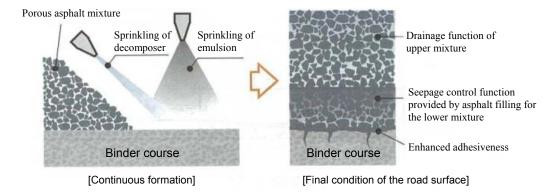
Construction of impermeable drainage pavement and the final condition thereof
